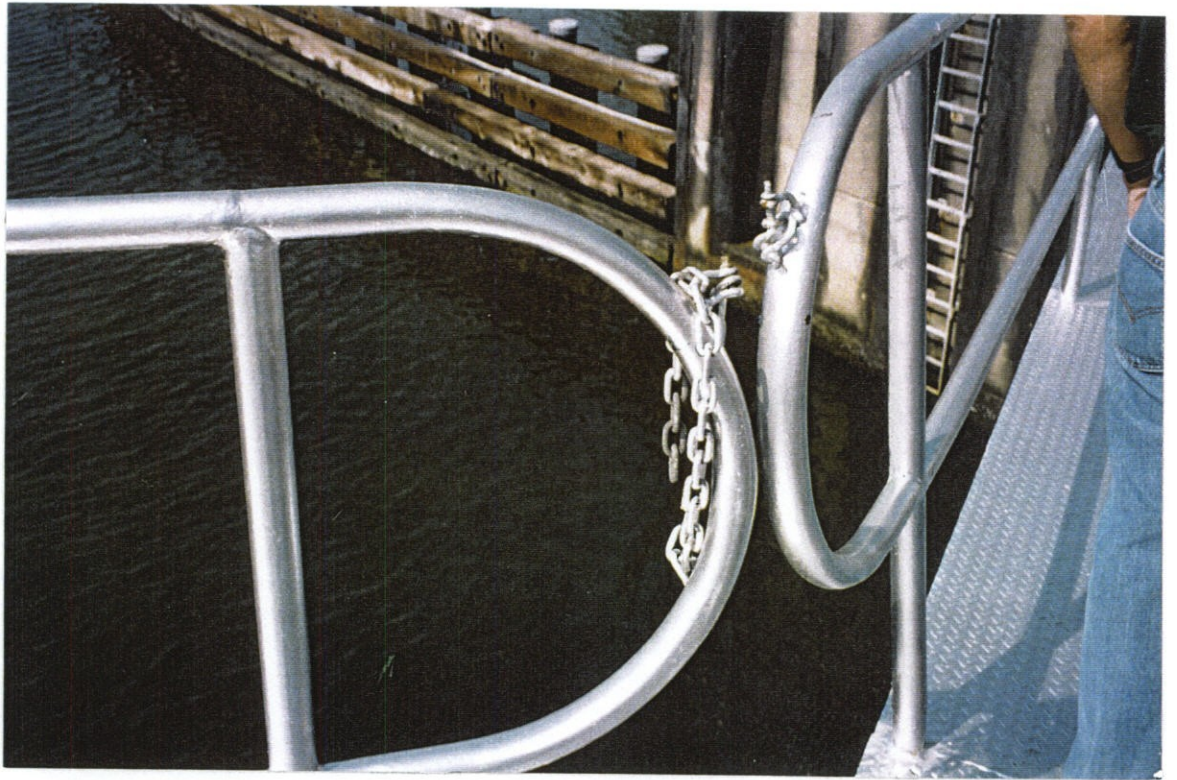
SLIGHTLY BENT (LEANING) HANDRAIL POSTS AT MITER END OF GATE SECTORS.
